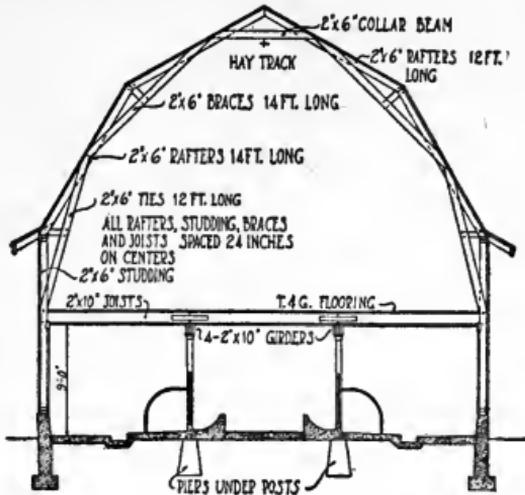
Cross Section Showing Detail of the Stable Floor, Barn Floor and Plank Frame Roof Construction
